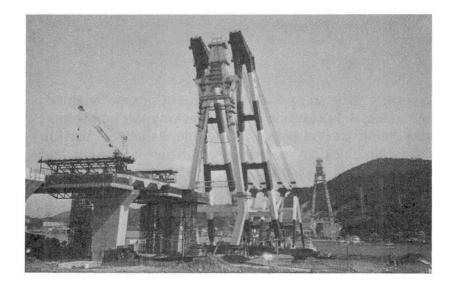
Large block erection: tower of the Ikuchi Bridge (courtesy of the Honshu-Shikoku Bridge Authority)
